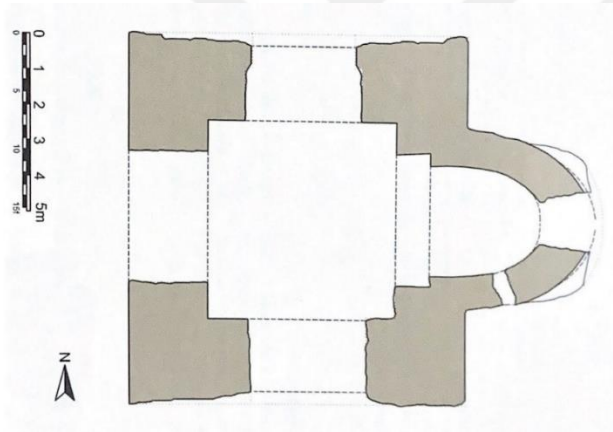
Plan of Hoşmat (Çakırkaş) Church (Source: EACHAR, 2018)
